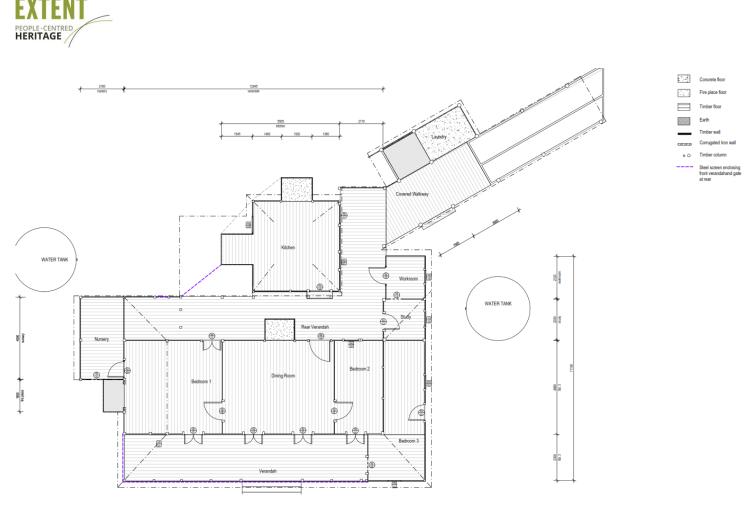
Extract of a floor plan of the main homestead at Boondooma. *Source:* Extract from drawing 21602EX A200, Issue P1, prepared by Gibson Architects (2021).
